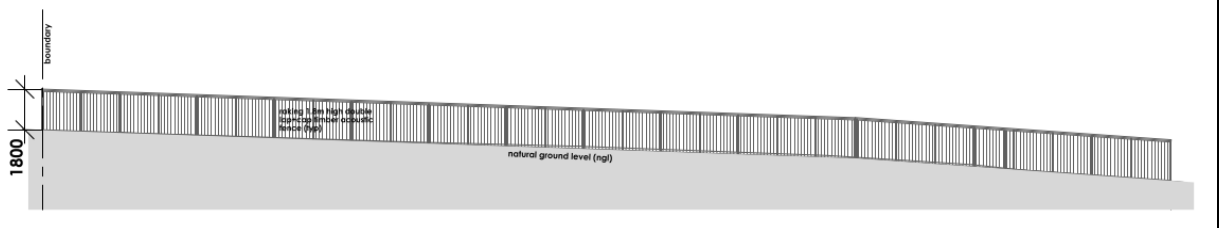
North-eastern acoustic fence elevation Source: Archizen Architects Issue D dated 08-02-2021
